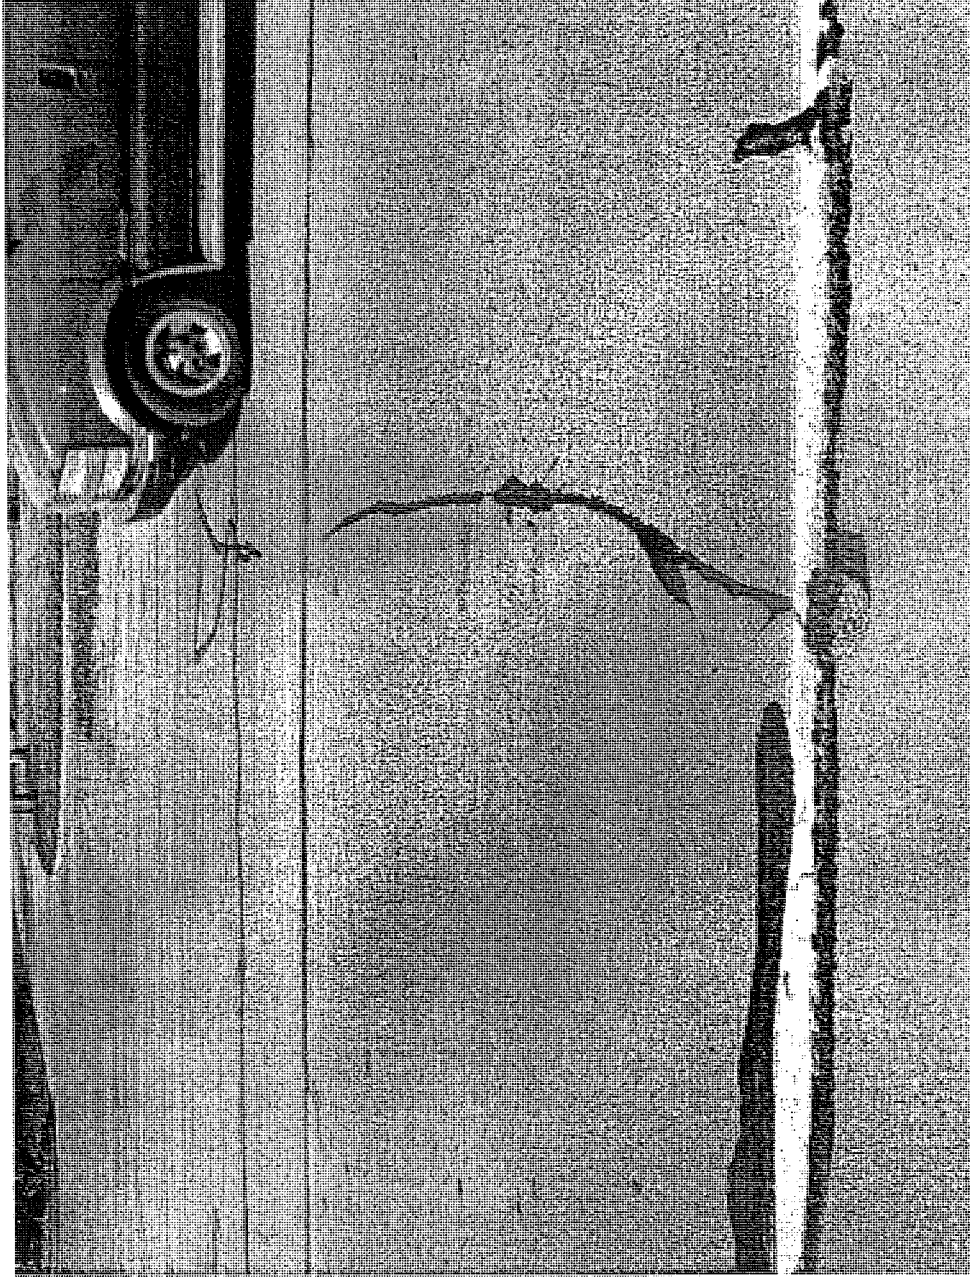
Reflective cracking on M-50, Control Section 46082 Job Number 32388 BMP 3.9, EMP 4.4
